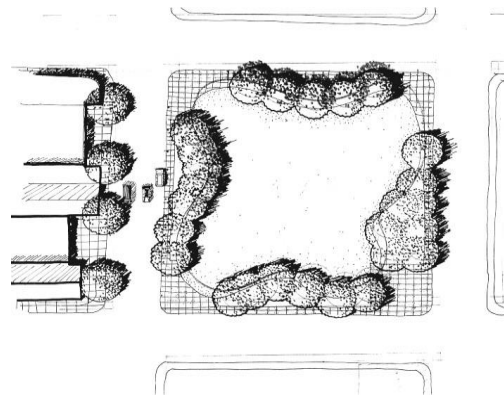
Example of plantings and berms used to create outdoor rooms within a common open space area.
